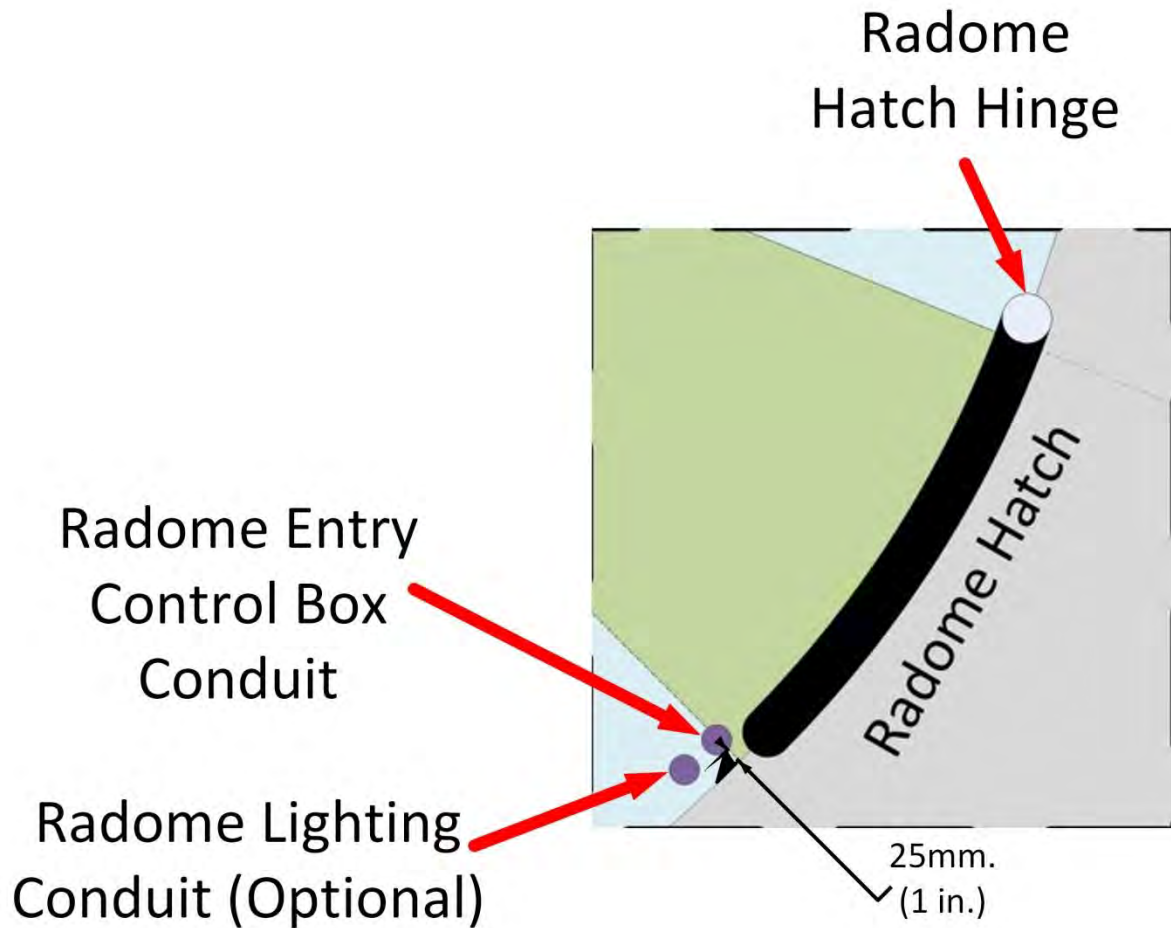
Close-Up of Conduit Location near Radome Hatch
